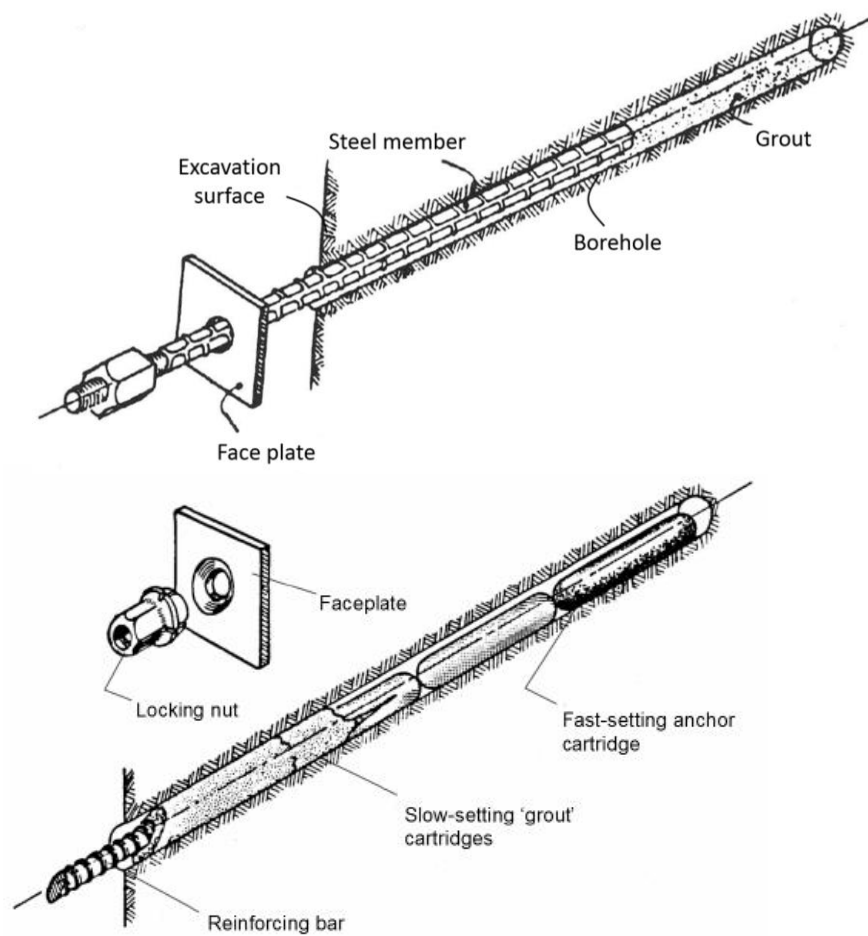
Top; Fully cement grouted rock bolt. Bottom; Fully resin grouted rock bolt (Hoek & Wood, 1987)
